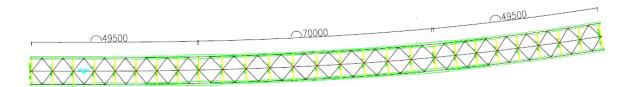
Longitudinal profile of lower braces. All measures are in mm.
